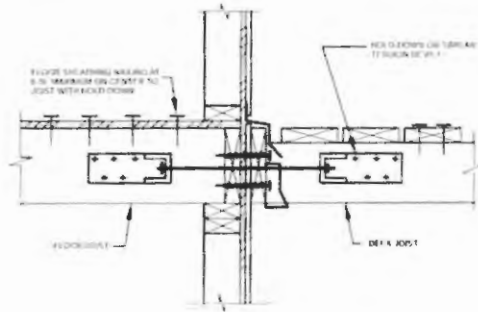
1 inch = 25.4 mm
